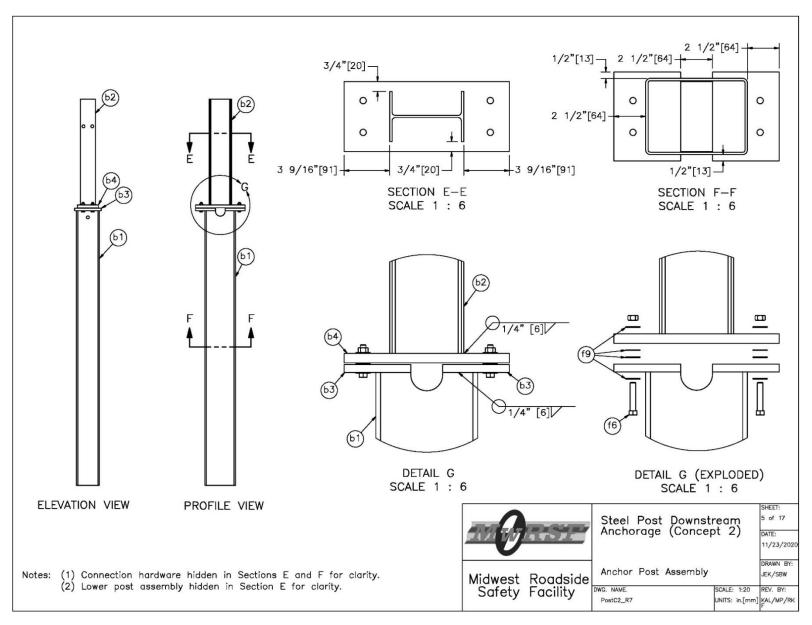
Anchor Post Assembly, Test No. SPDA-2
